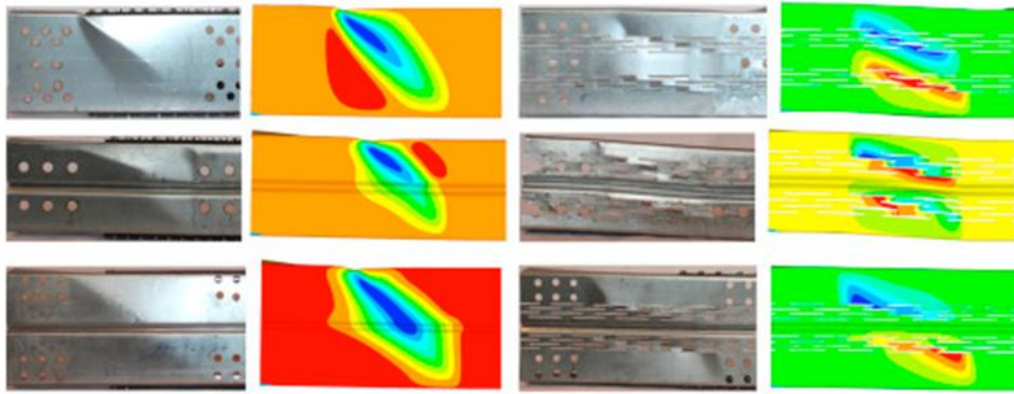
25. Failure mode shapes of tested specimens (left column) and FE models (right column) [86].
